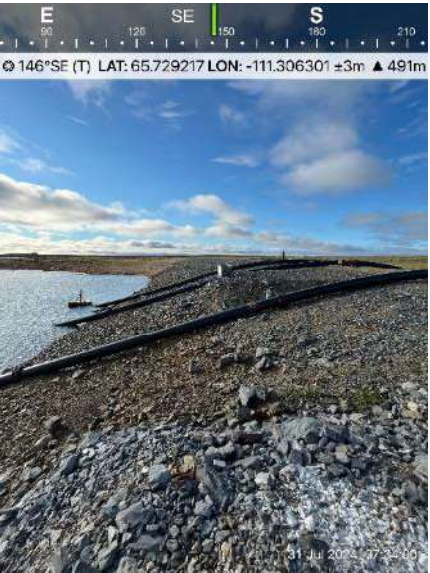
Dewatering siphons routed over the crest of Dam 1A.
